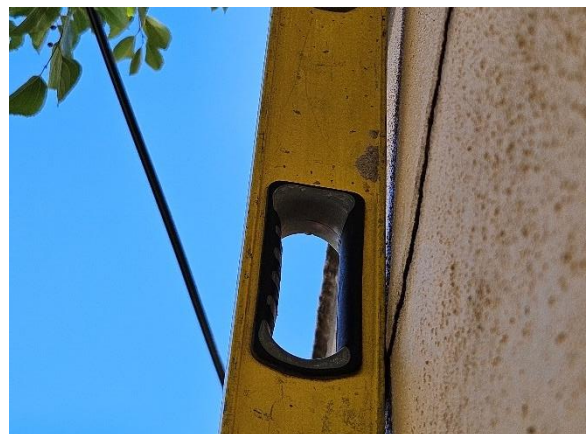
Spirit level placed against front elevation and over gable cracking at ceiling level – gap between top of level and wall indicative of inwardly directed rotation of wall above ceiling level and "bow" in wall (refer Photo 3)
